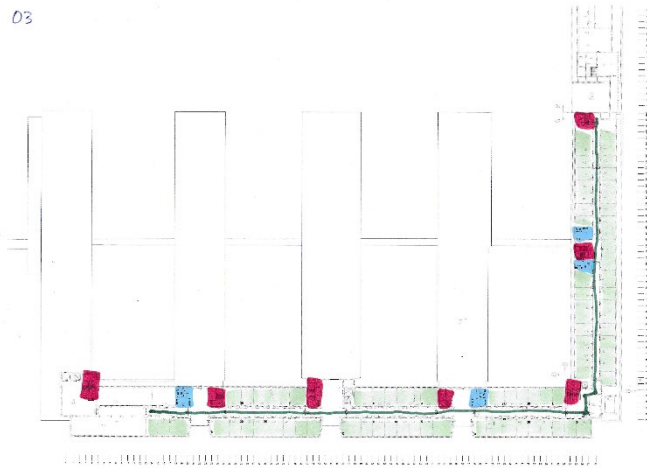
Fourth floor (Red: Stairwells, Blue: Toilets, Green: Repetitive office structure)
